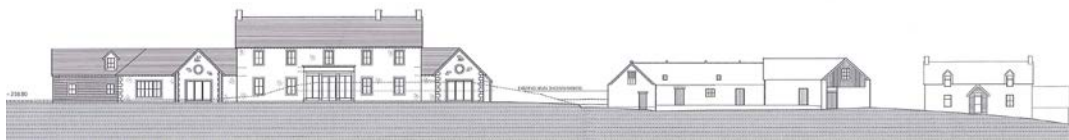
Proposed new dwelling, renovated steading and existing cottage
